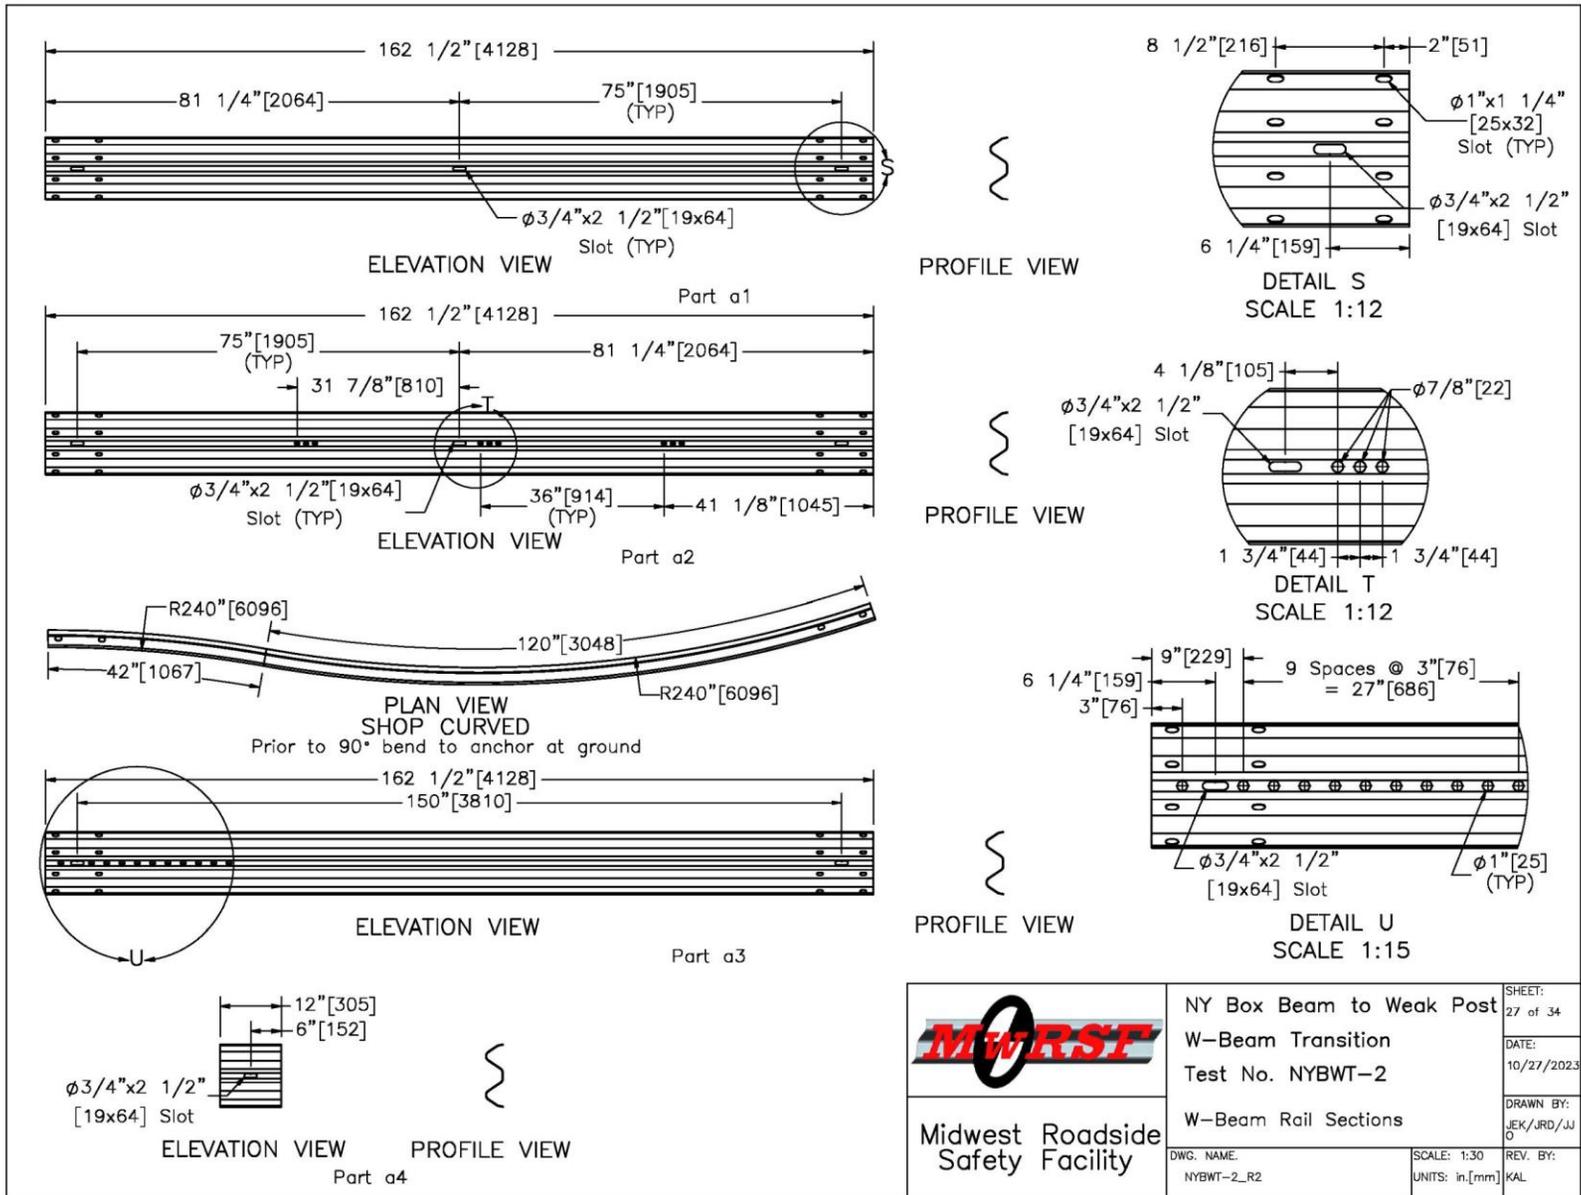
W-Beam Rail Section, Test No. NYBWT-2
